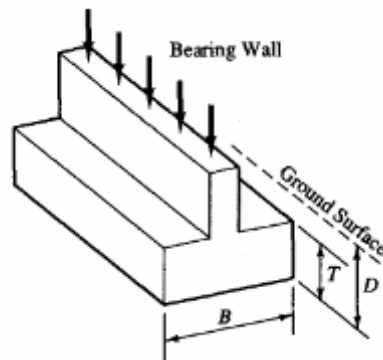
Continuous spread footings (SNU geotechnical engineering lab, 2018)
